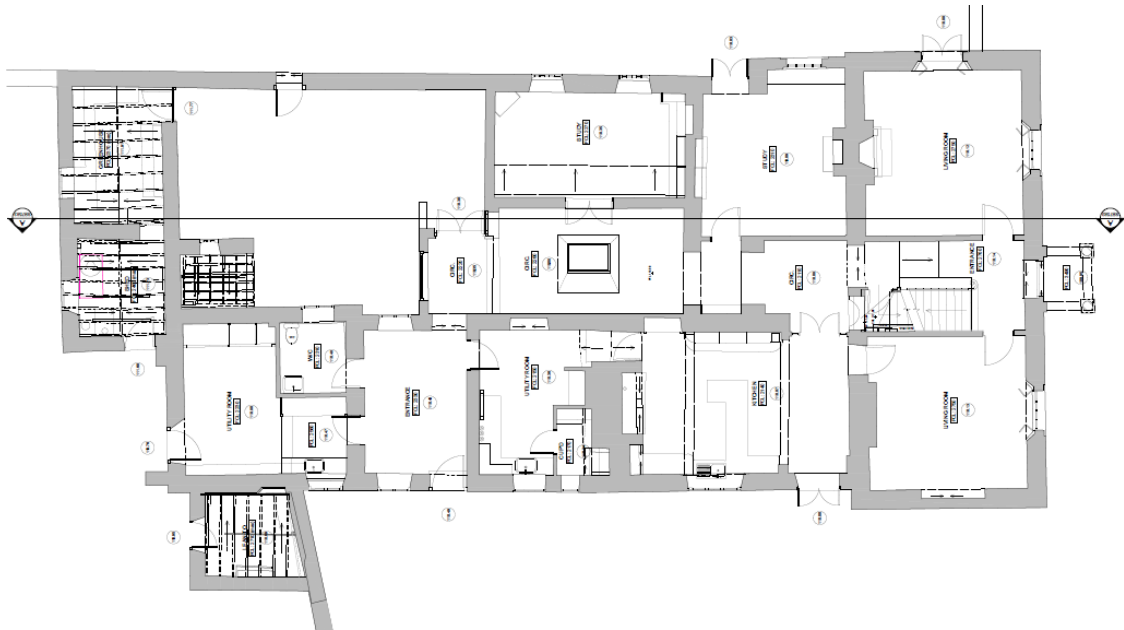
Existing Ground Floor Plan (Concept Eight Architects, 2023)
